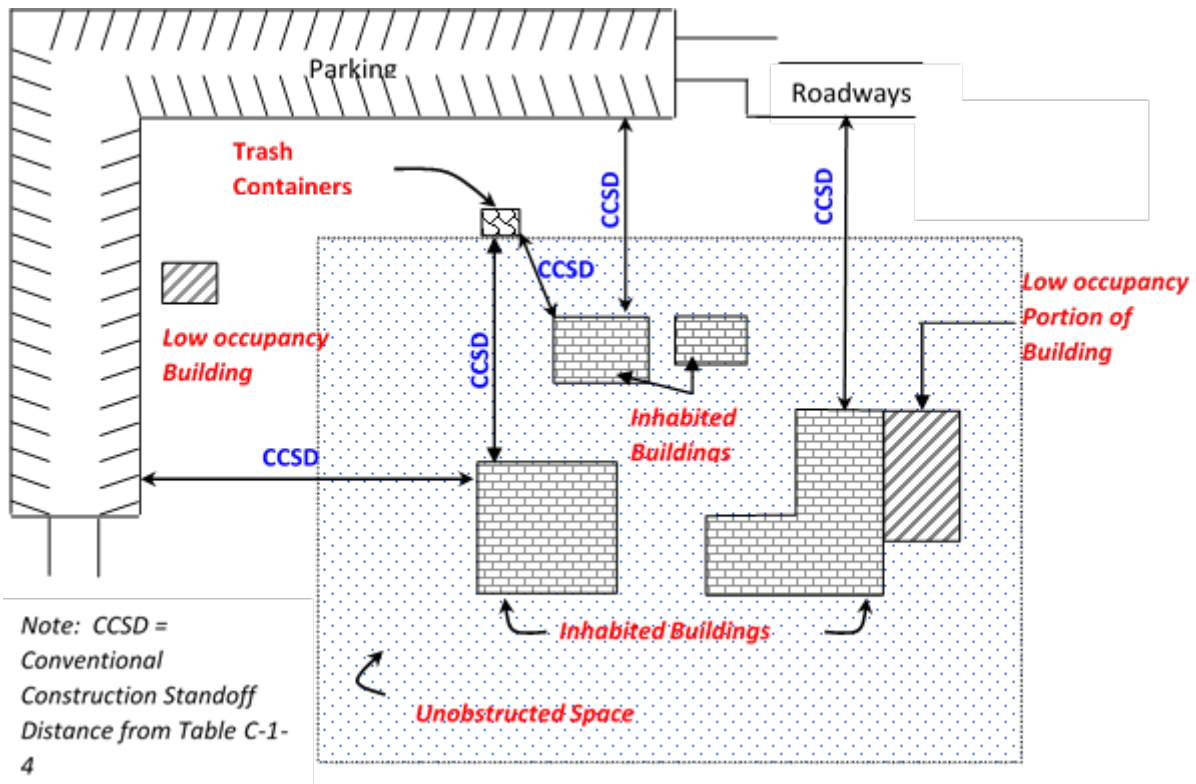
Parking and Roadway Control for Existing Buildings – Controlled Perimeter
